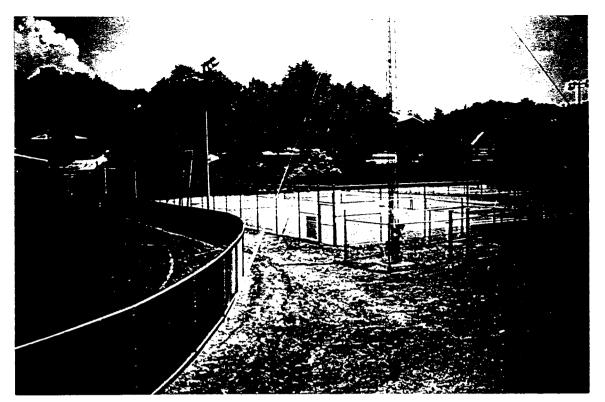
Proposed site area showing ASU Lackey Baseball Field and tennis courts.
